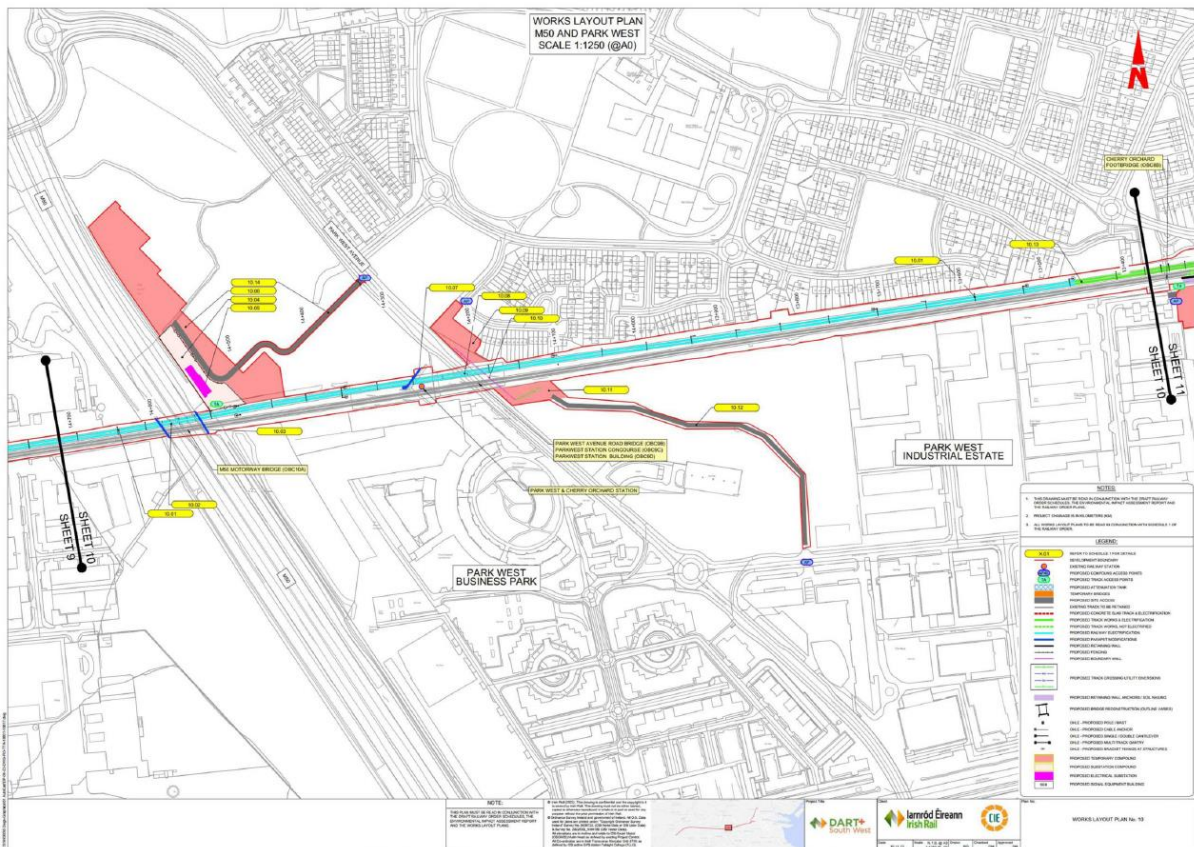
Works Layout Plan No. 10 (extract from the DART+ South West Railway Order)
